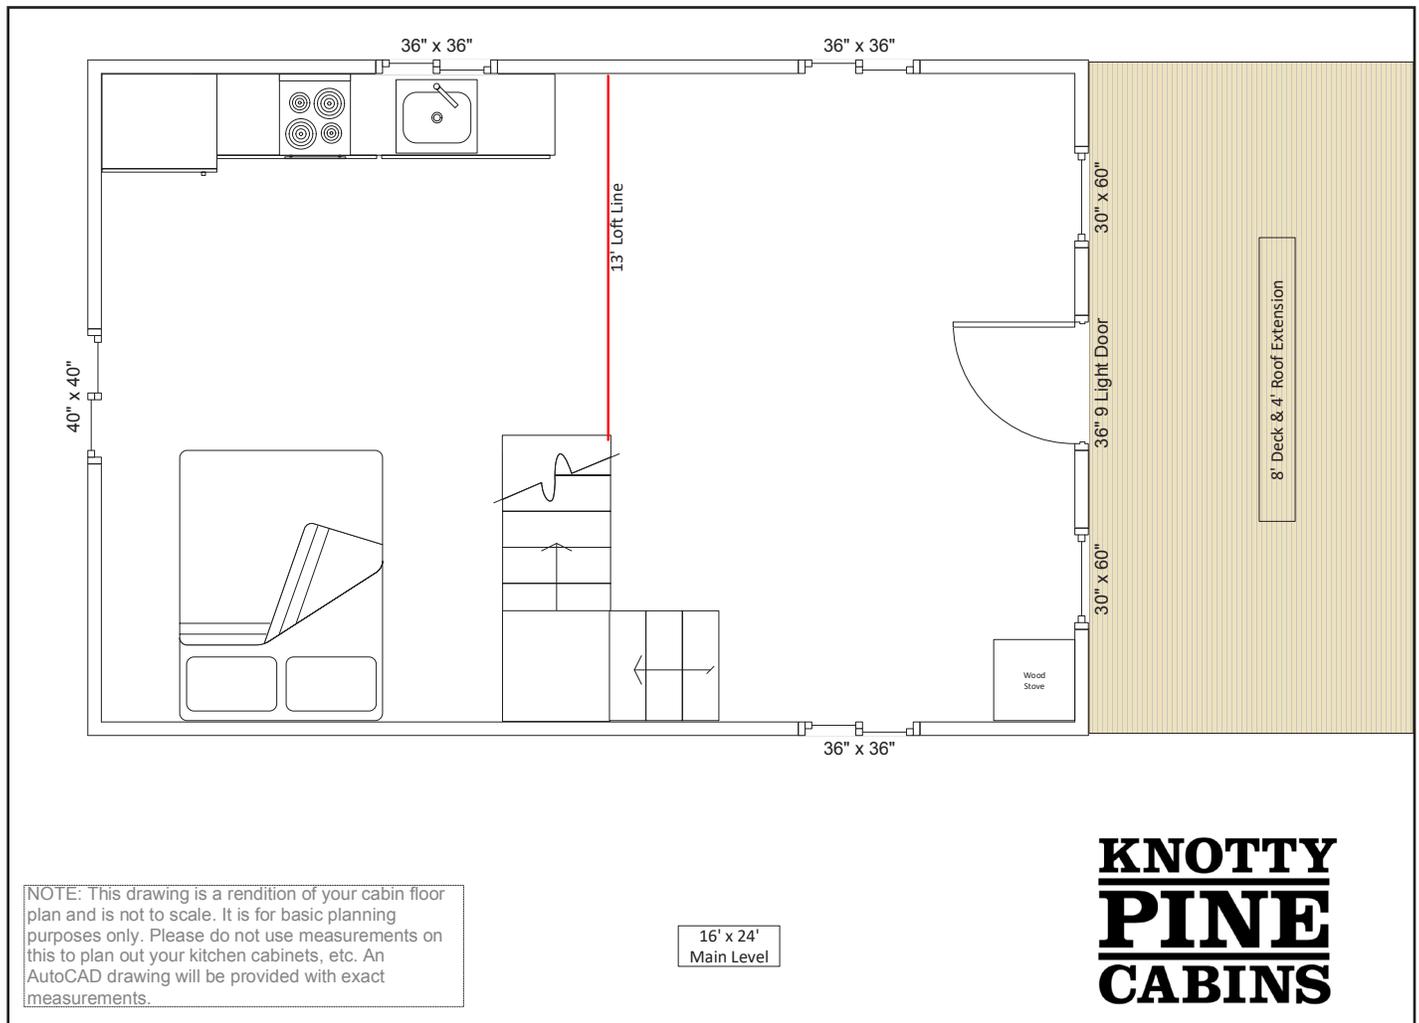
Cabin floor plan provided with the project description (LKDFN 2020).
